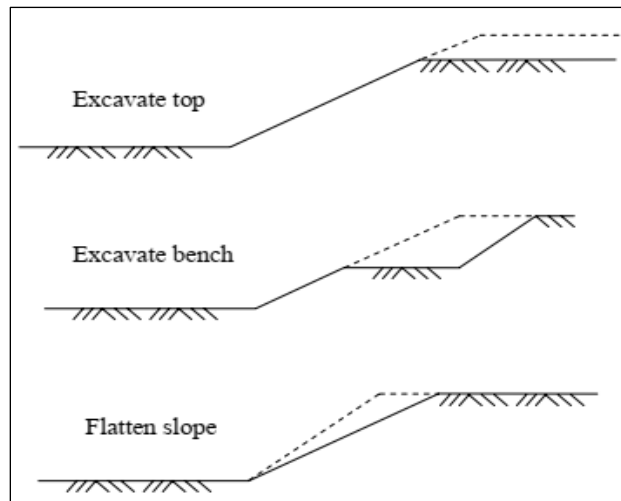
Schematic diagram of a slope stability improvement by excavation (Wanstreet, 2007)
